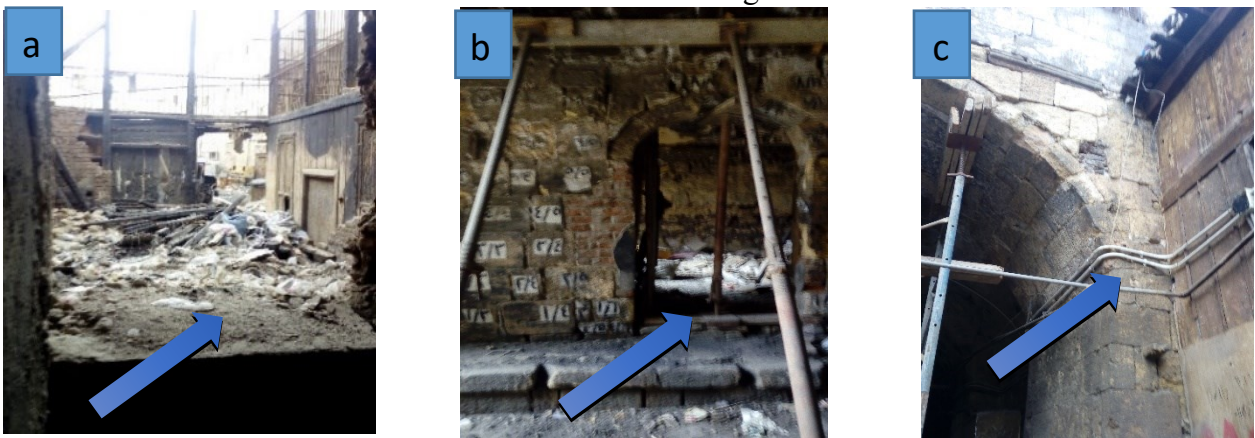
Man-made factors such as electric wires and scattered garbage, which spreads animals and activates biological damage. a. & b. scattered garbage inside the building. (c) Electric wires outside and inside the building
